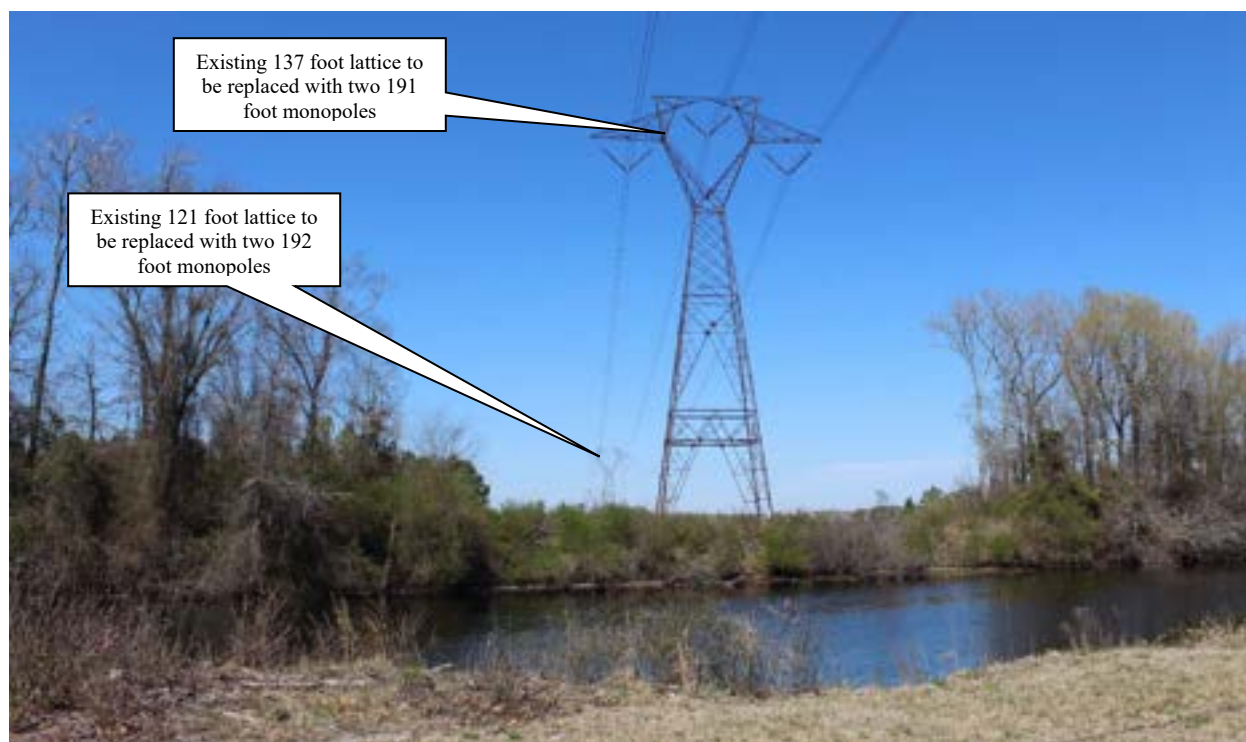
Photo location 1- View from Dismal Swamp Canal at project alignment, facing northwest.
